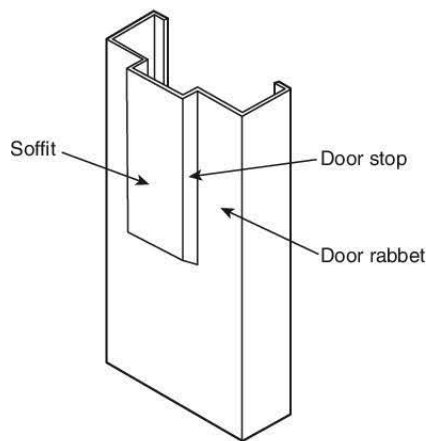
Hollow Metal Door Frame with Terminated Stops.
